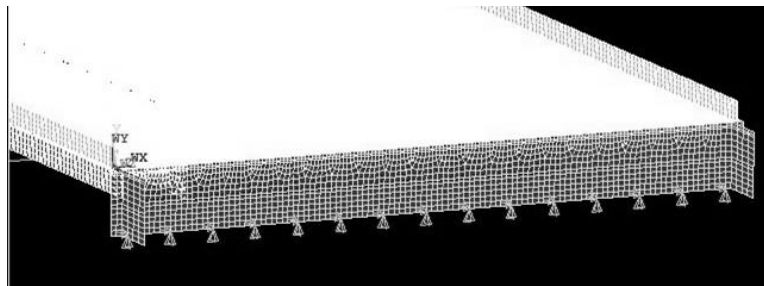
Roller supports used to replace the piles at the bottom of the abutment
